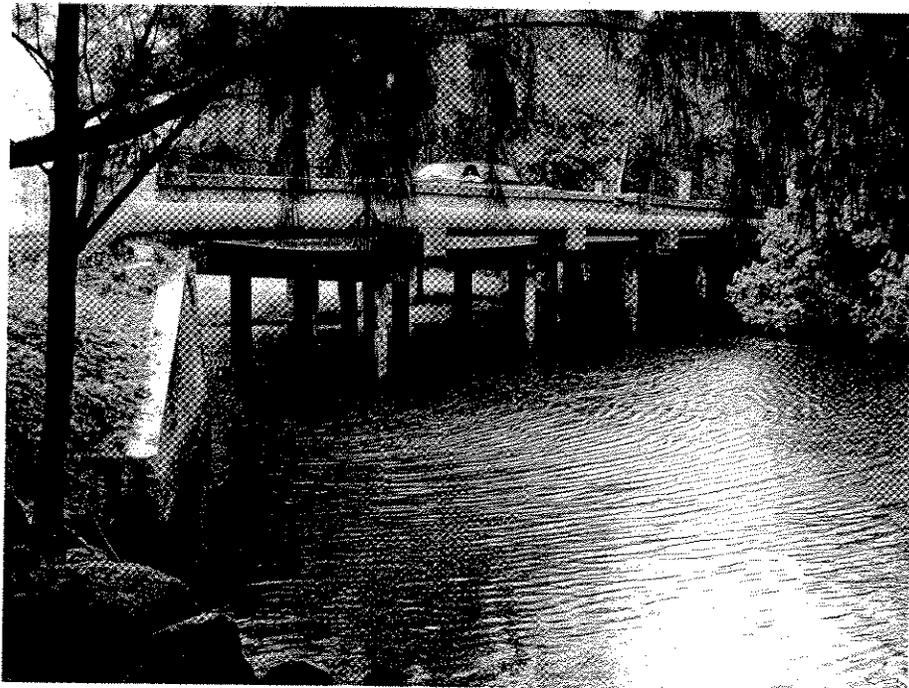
Mauka Face of North Kahana Bridge (June 2002)
